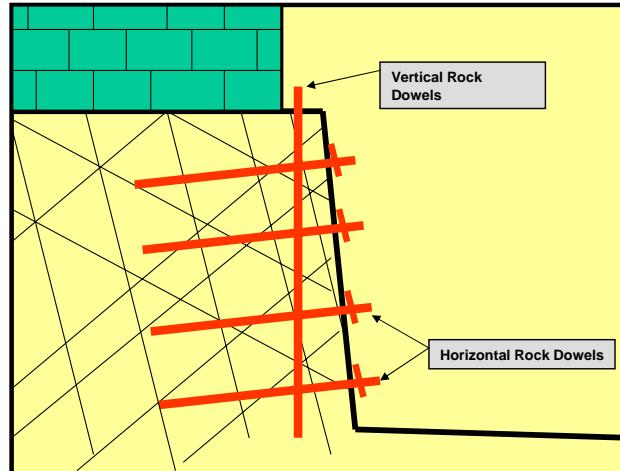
Schematic section of a rock slope illustrating the use of rock dowel pre-support (vertical dowels) and horizontal rock dowels.
